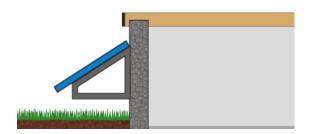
Facade Installation (Horizon Renewables, 2013)
